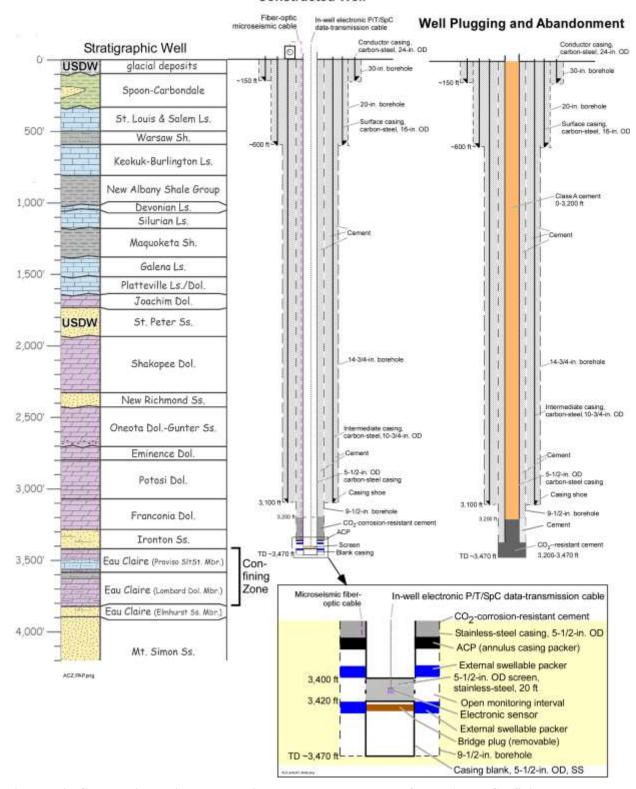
Construction design and plugging and abandonment plan for the Above Confining Zone monitoring wells.
